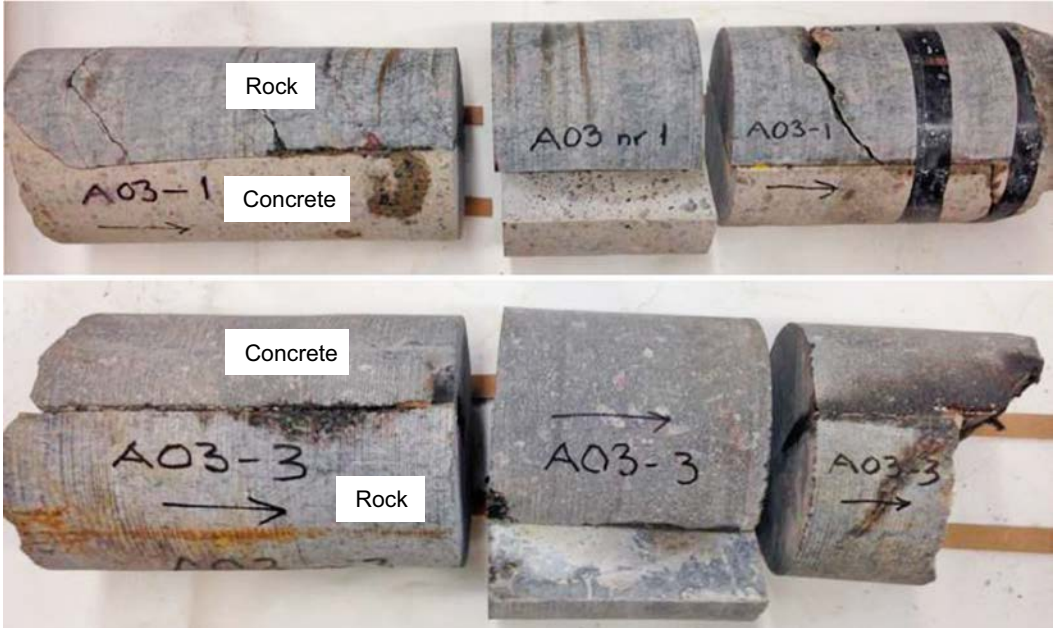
Examples of drill cores (A03) from the interface between rock and concrete immediately after drilling. The water stops (dark squares) and grouting pipes (light colored halve-circles) are clearly visible. Also, a thin layer of grout (light color) at the interface. These cores seemed to be attached to each other after drilling, i.e. a certain bond strength existed.
